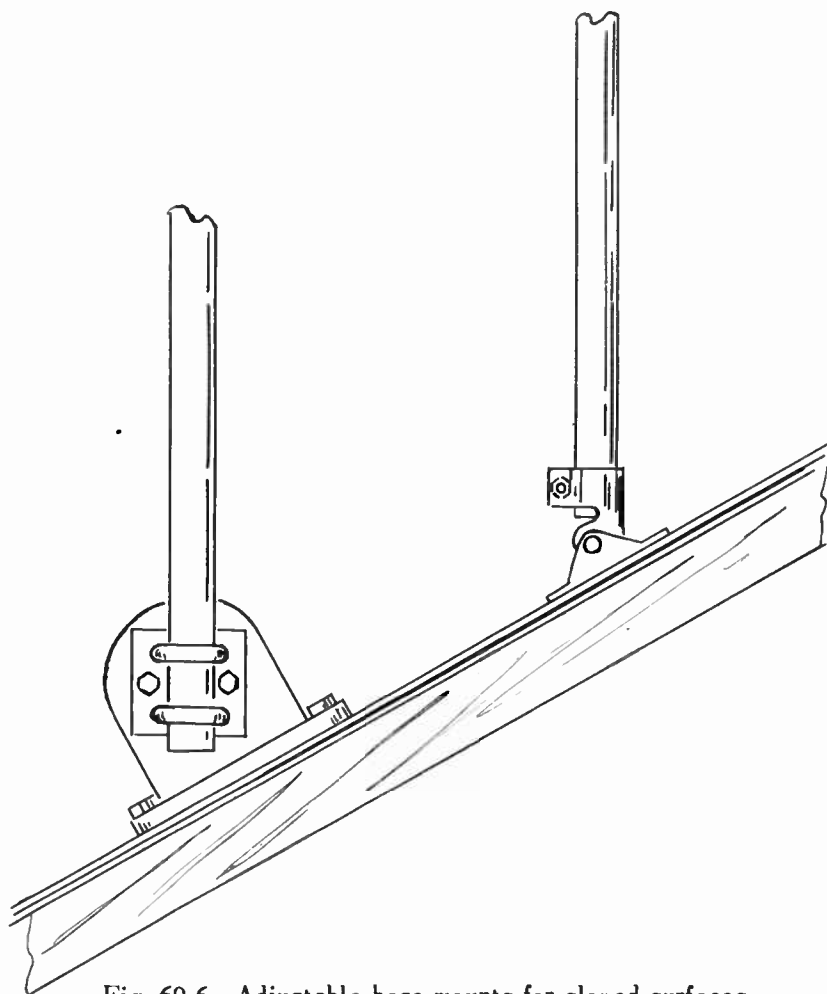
Adjustable base mounts for sloped surfaces.
